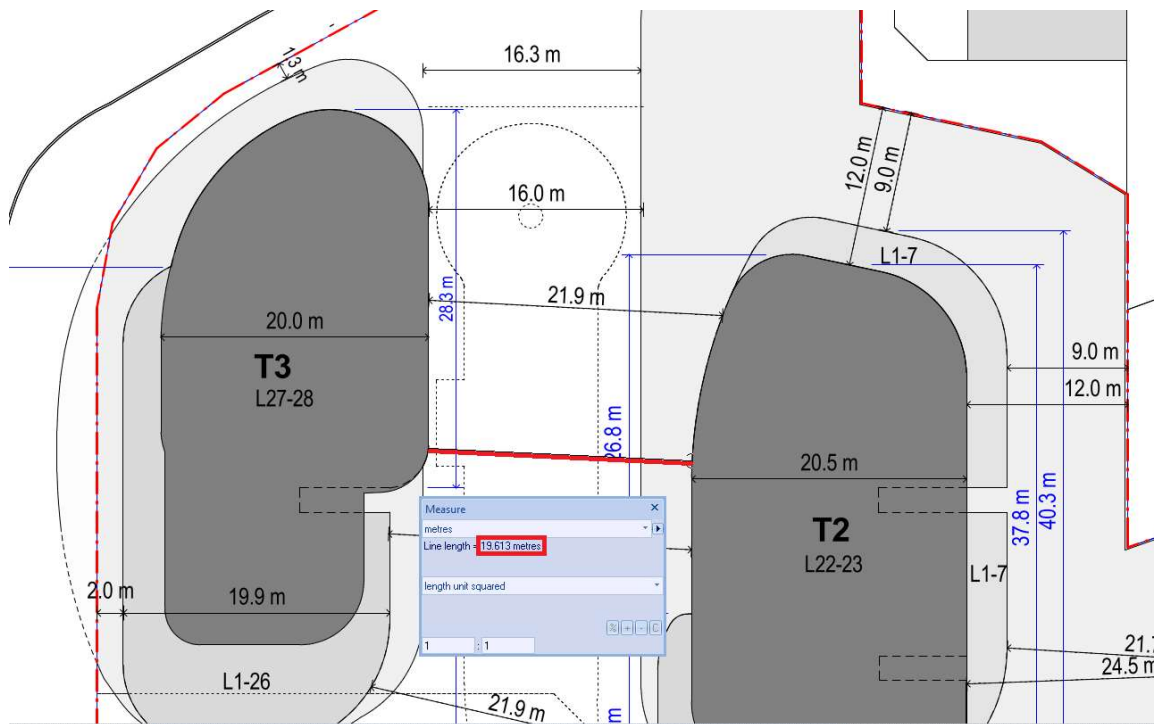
Minimum Separation between CBUS Towers 2 and 3 (19.6 metres).
